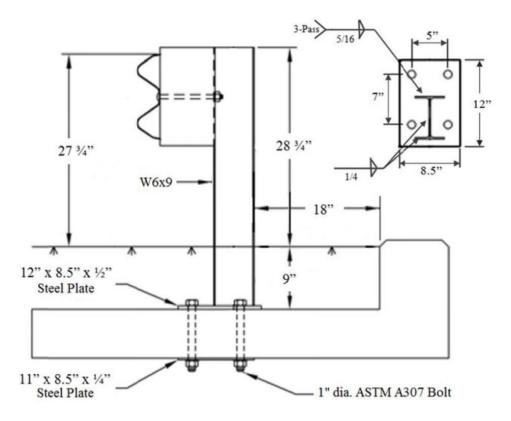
NCHRP Report No. 350-Compliant, Modified G4(1S) Guardrail Attachment to Low-Fill Culvert [5]
